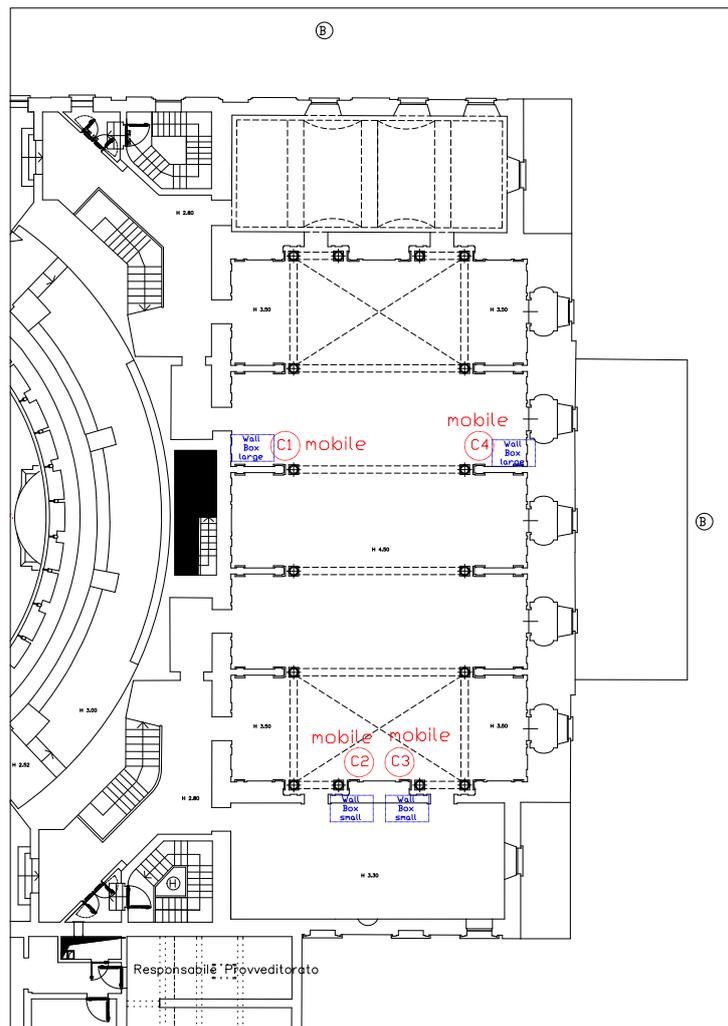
Schematic View of the proposed locations for cameras and signal hubs (Wall Boxes) at the Ridotto Galleria.
